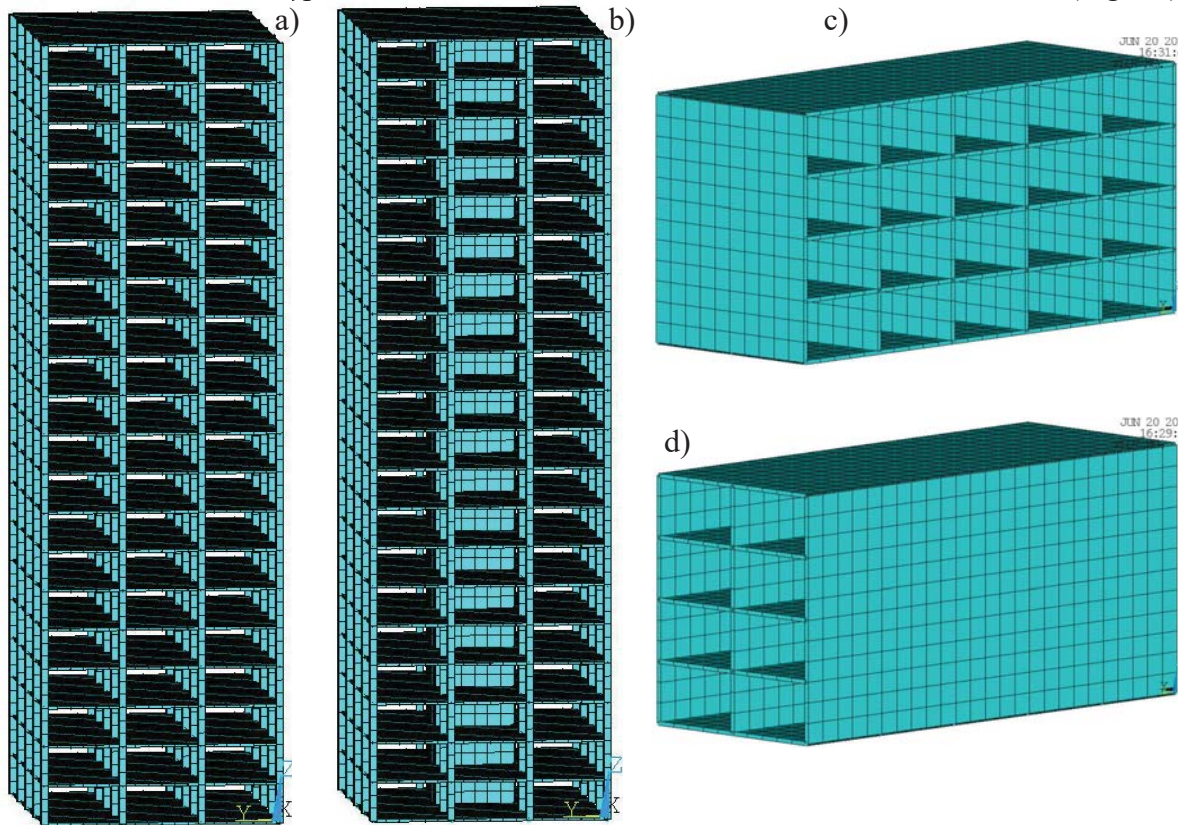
Office towers of 3×4 floor bays and 20 storeys, a) without core walls, and b) with core walls, 4-storey residential buildings with 2×5 floor bays and c) walls across and d) walls along the building.
